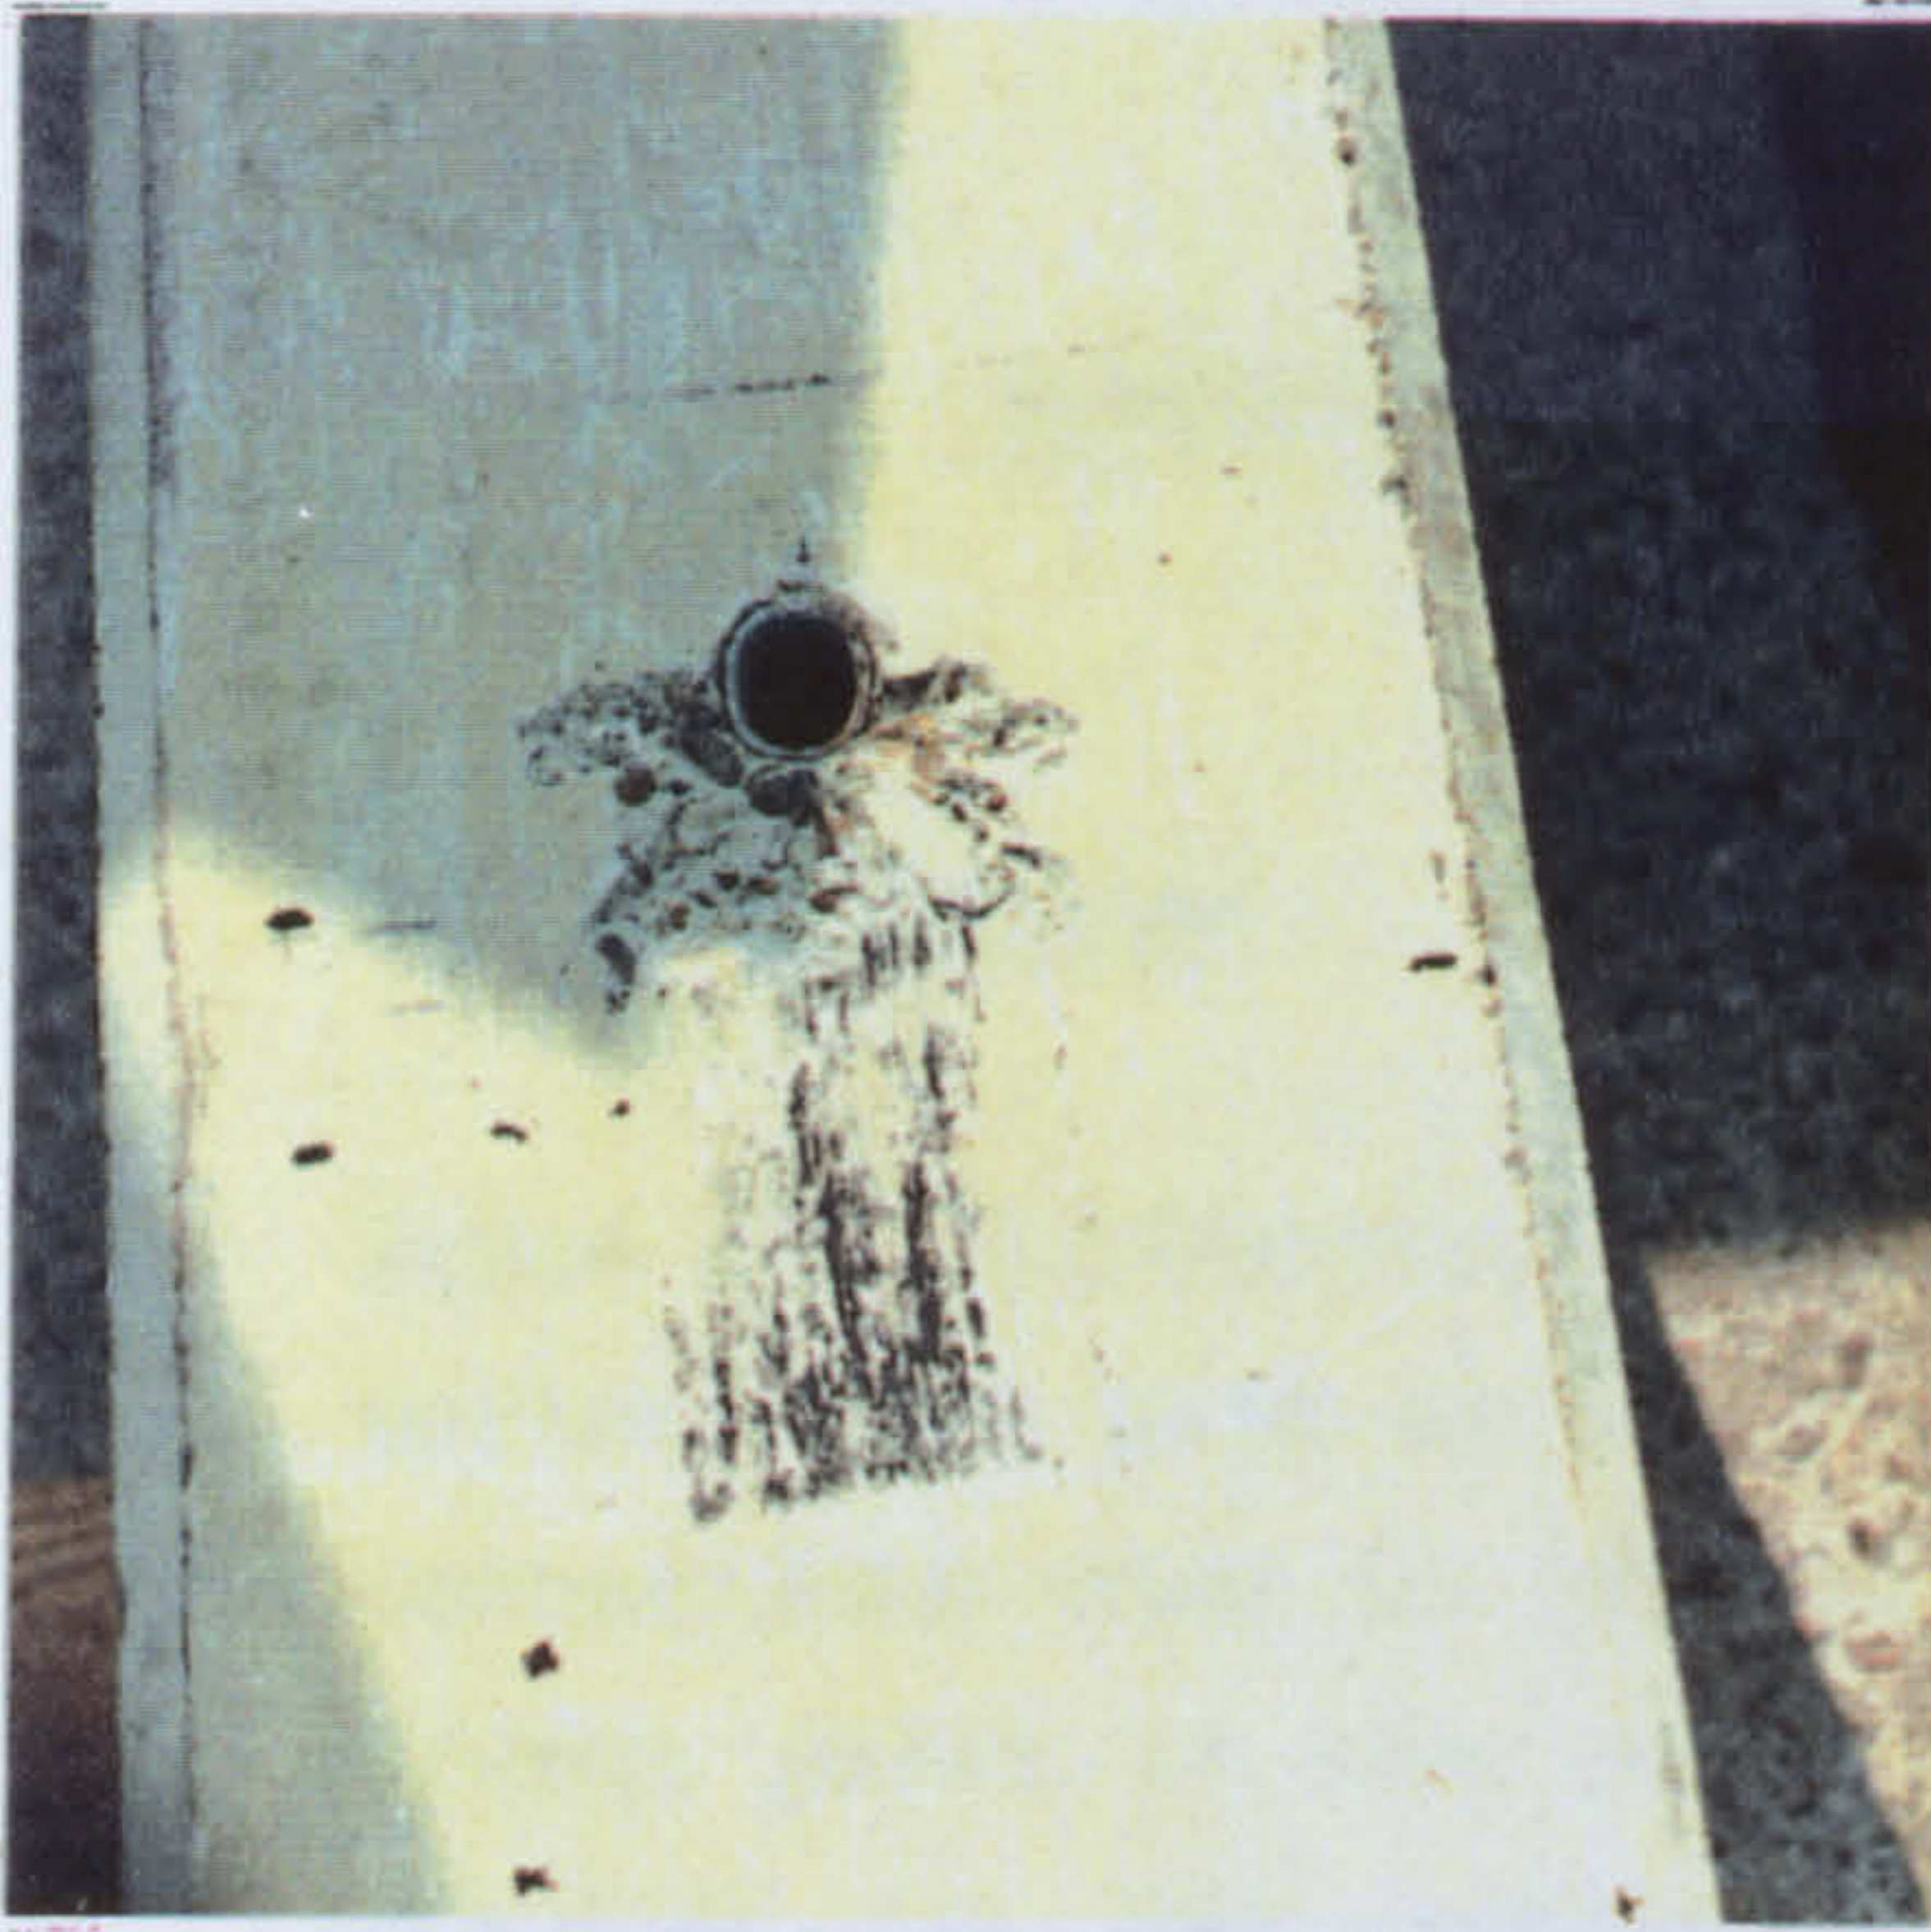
FRICTION MARKINGS AND CONCRETE SPALLING ON THE FACES
